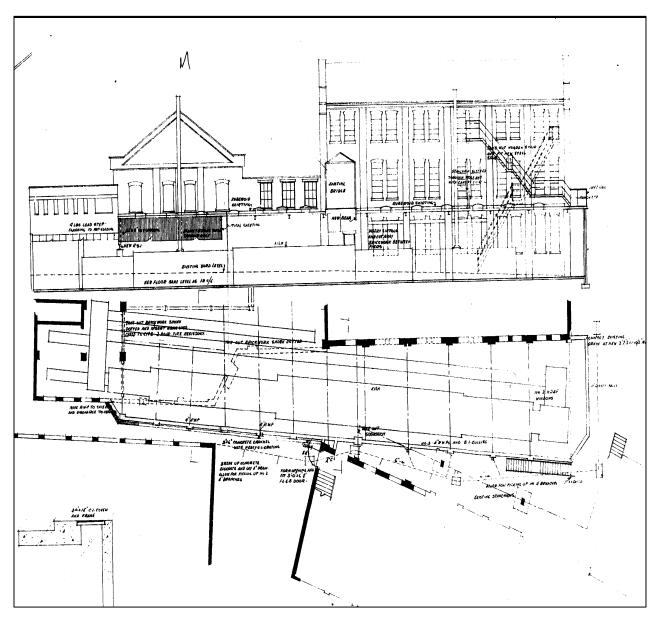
Building P. West elevation: Lavatories (left), Building M (with the gable end) and the long side of Building R. The three windows between Buildings M and R belong to the extension built in 1941 for the tunnel kiln in Building O. The intended Building P lies to the front. Plan: showing the intended tunnel kiln.³⁷
